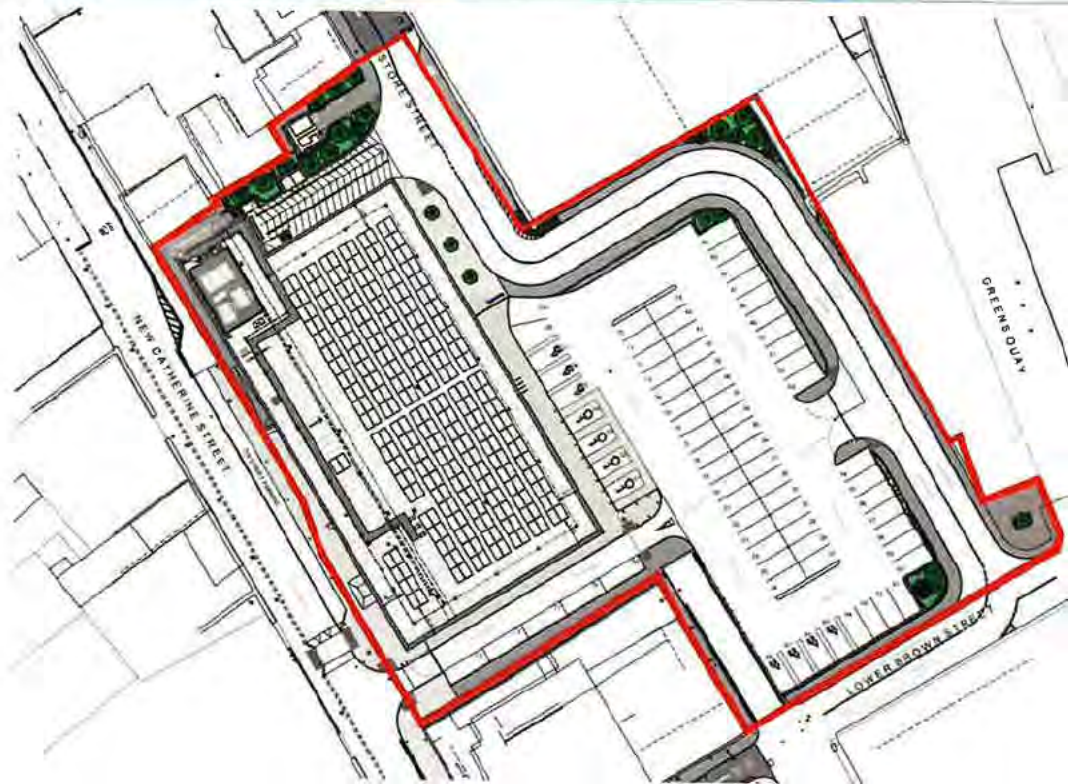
Extract from drawing no. 20984-THPK-27-XX-DR-A-103 "Proposed Site Layout" showing the proposed site and panel layout.
